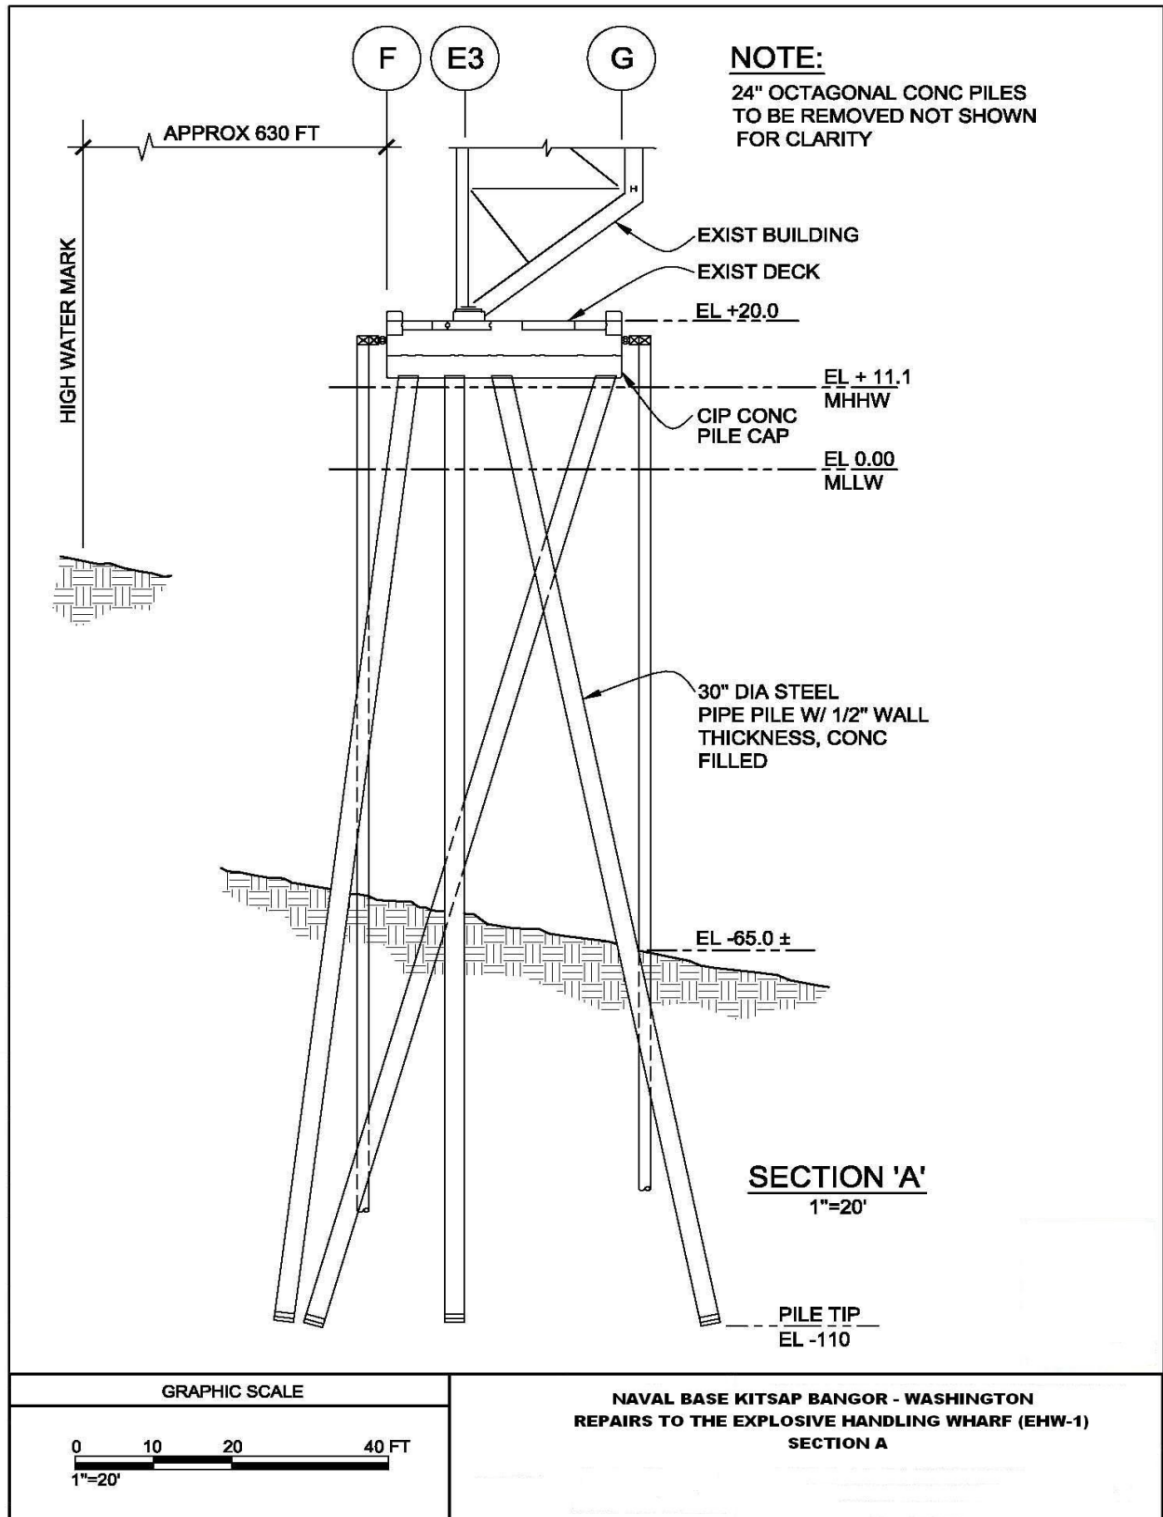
Example Repairs to the EHW-1 Facility – Section A
